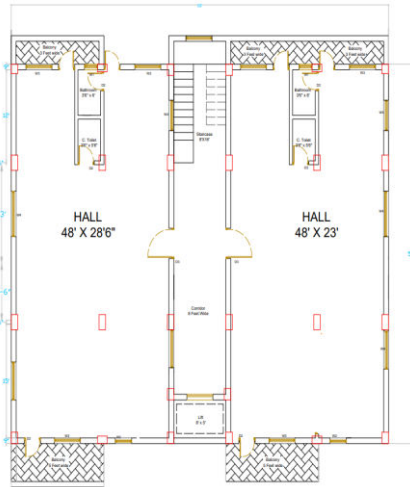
Ground Floor Plan of Stiffness Irregular Structure
